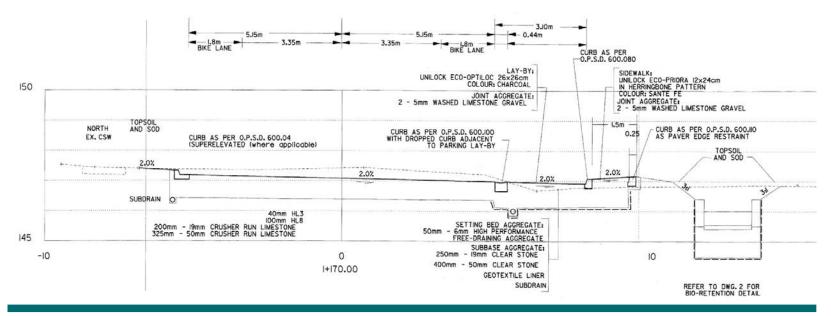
Road cross-section showing side-shed style road drainage and bioretention planter. (Source: City of Mississauga; The Municipal Infrastructure Group)
